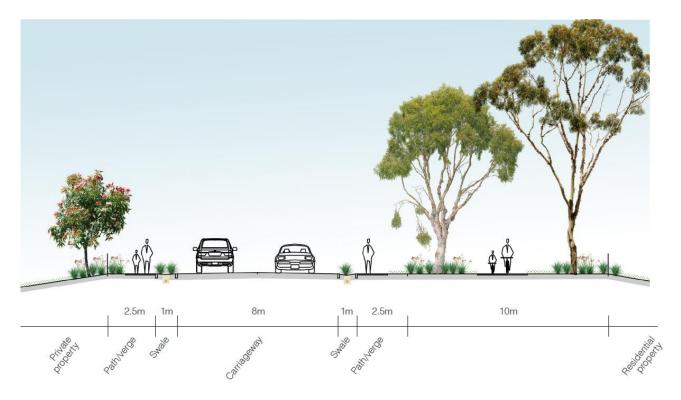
Typical street section – Local Road with pedestrian / cycle green link (15m + 10m reserve)
